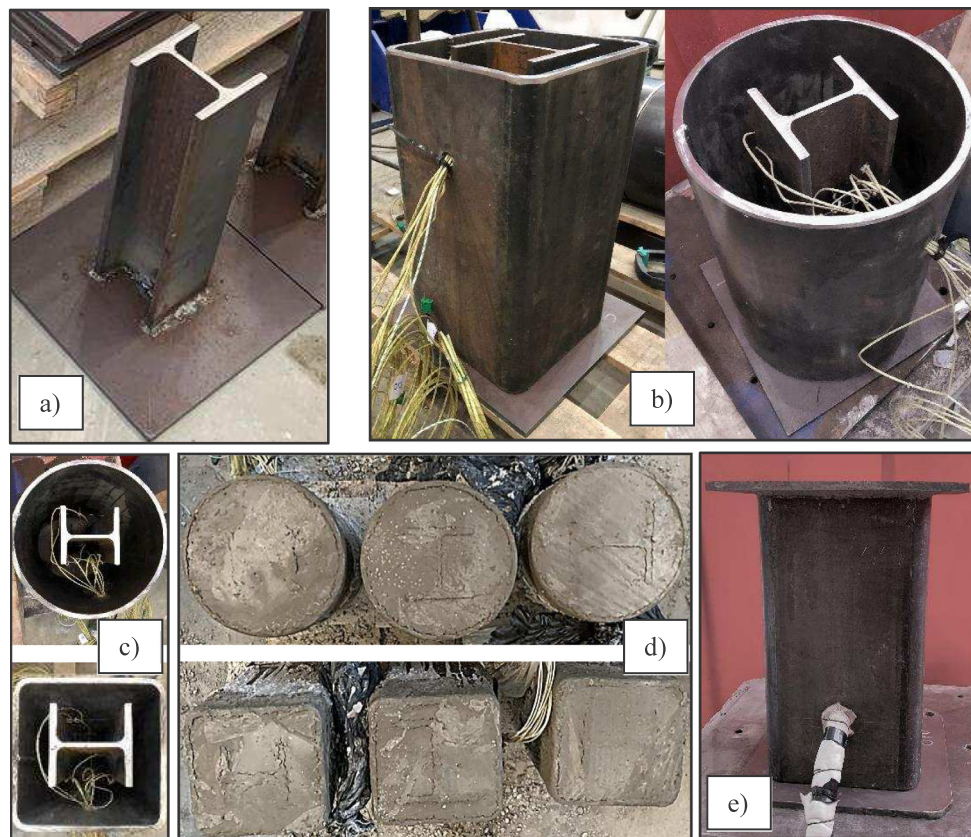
Columns preparation: (a) Steel plate welded at bottom end of the embedded profile; (b) Positioning of hollow steel tube; (c) Positioning of thermocouples; (d) Columns after casting; (e) Column finished.
